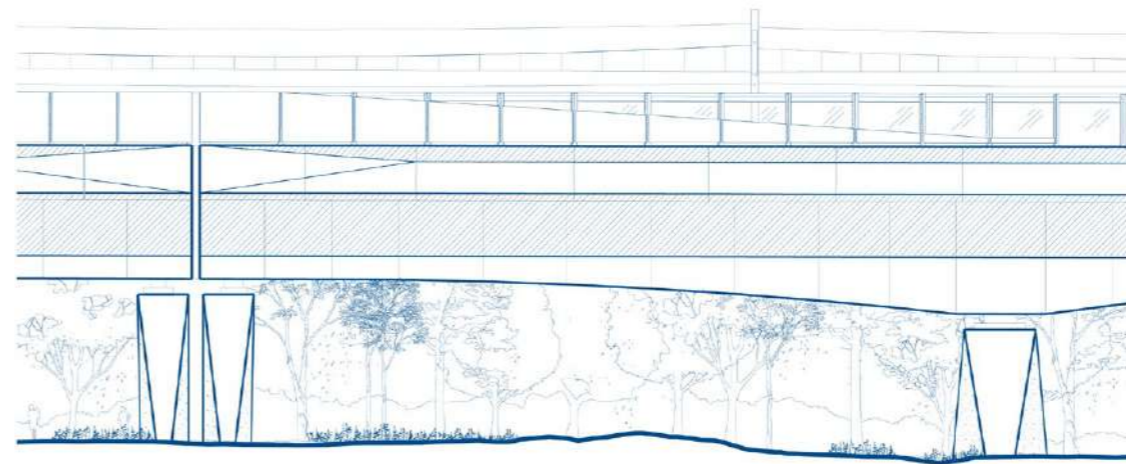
\_ Proposed Elevation - 4m opaque to 4m hybrid transition
